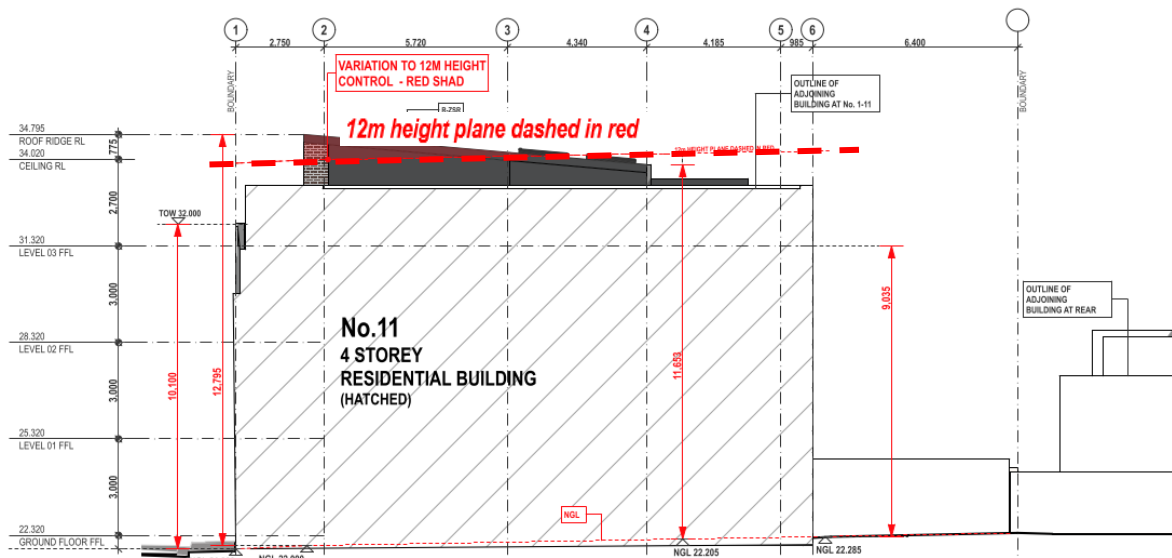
Proposed west side elevation of the building, indicating proposed contravention by a red dotted line
